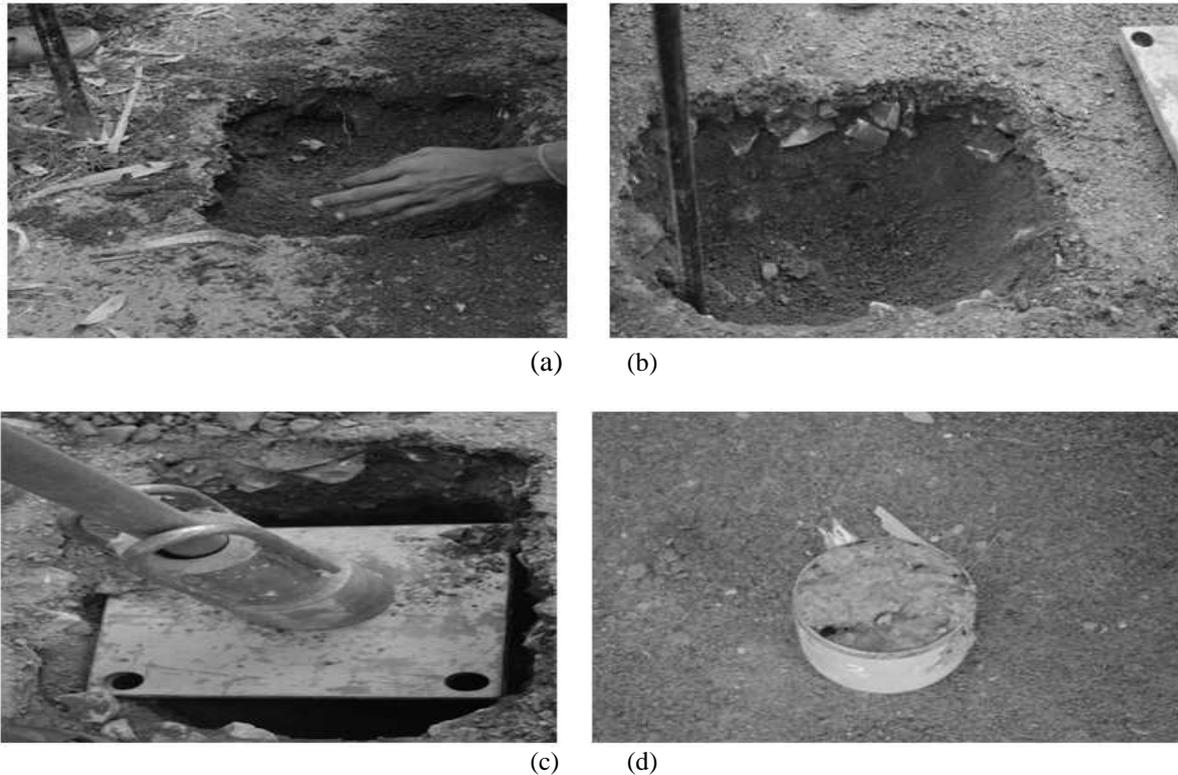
Photo plates during collection of CBR sample of JBD road. (a) Marking for the excavation of pit; (b) Excavation is in progress; (c) Penetration of CBR mould into subgrade soil with the help of Hammer and plate; (d) CBR sample from field (before dressing).
